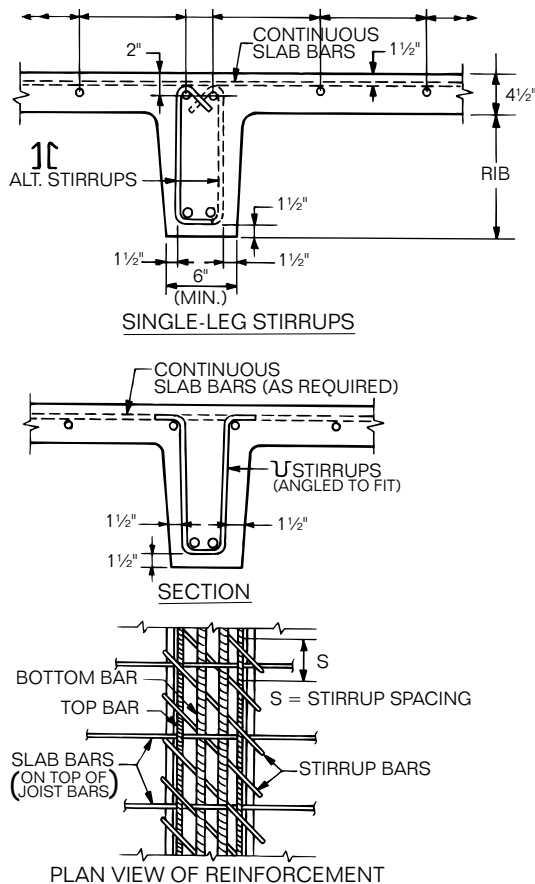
Details for Single Leg and Common U-Stirrup Applications for Shear Reinforcement in Wide-Module Joist
